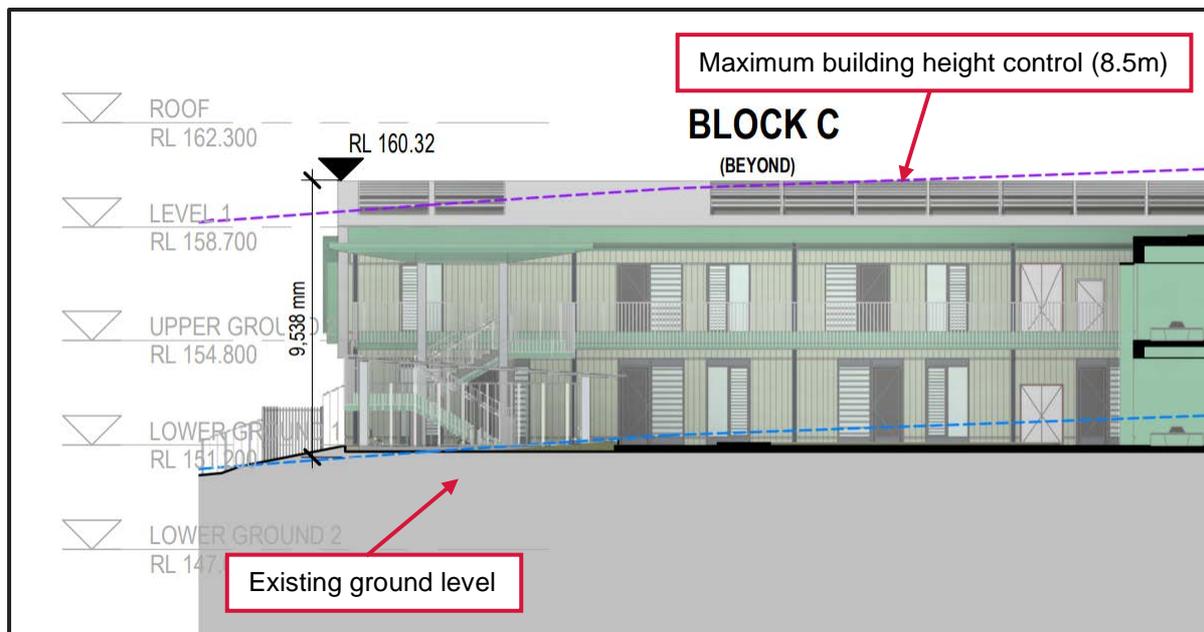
| Maximum building height control at Block C via site section (Source: Applicant's EIS)
